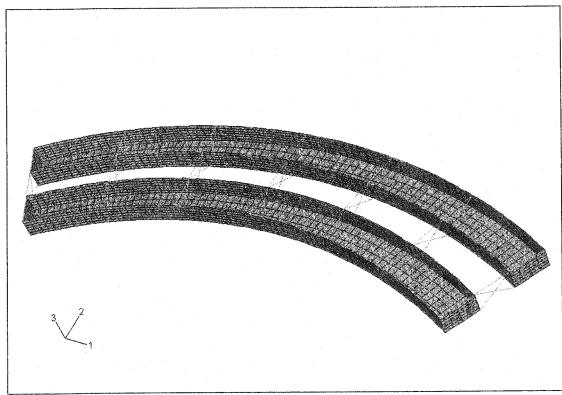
ABAQUS model view of bridge model M1 without concrete deck
